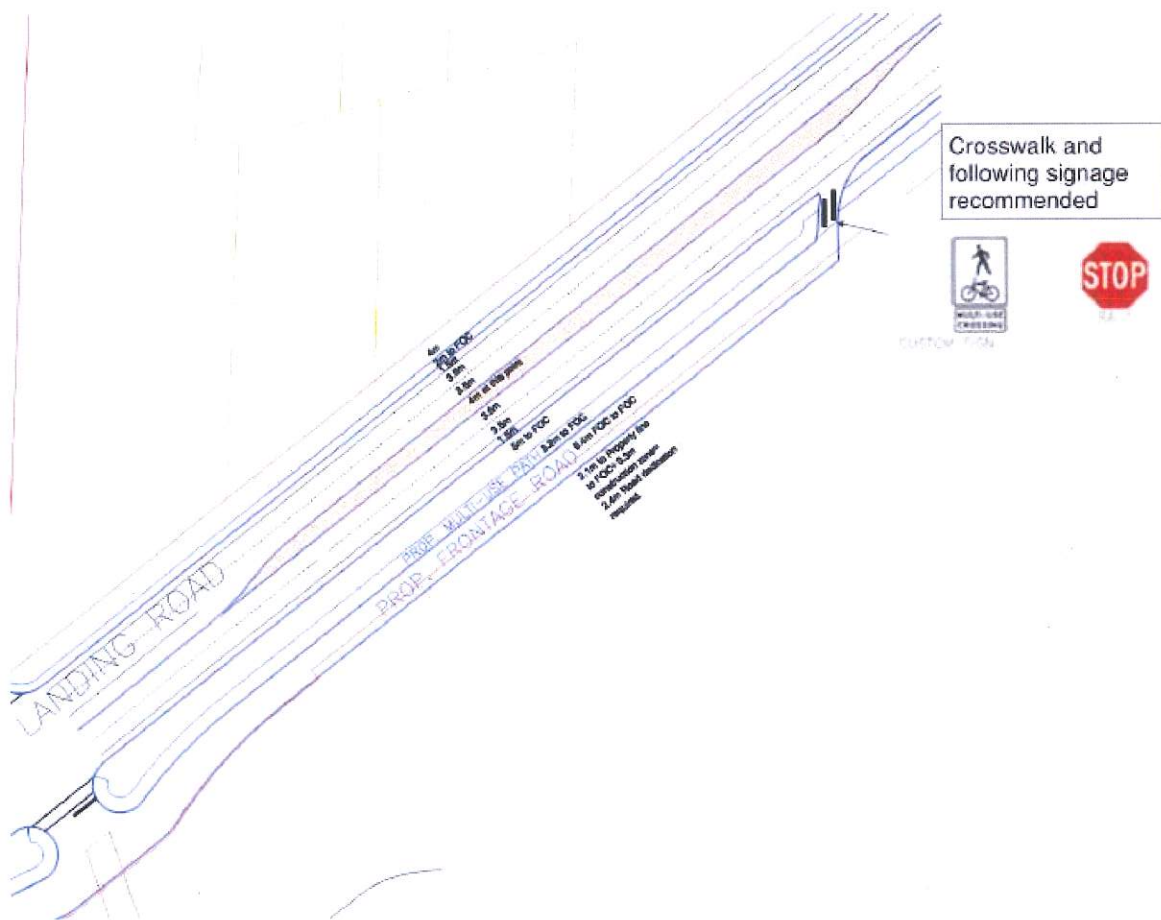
Proposed Measure for Multi-Use Path Crossing the Road
